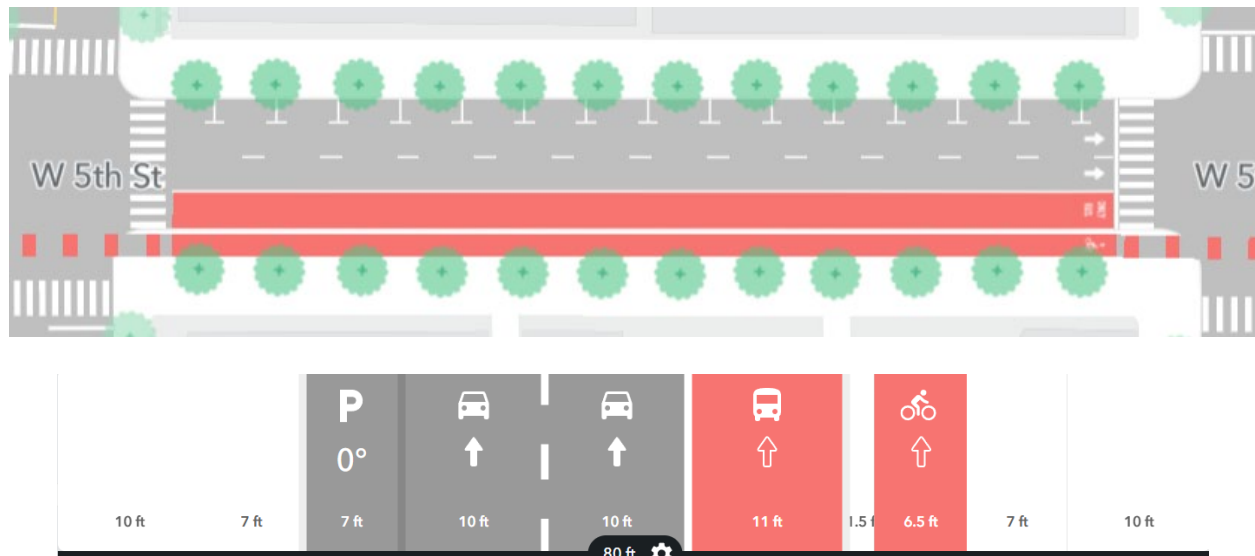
Example of Typical Section on 5th St - Transit-only Lane Bicycle facilities, two travel lanes, parking and loading, and wide sidewalks with trees.
